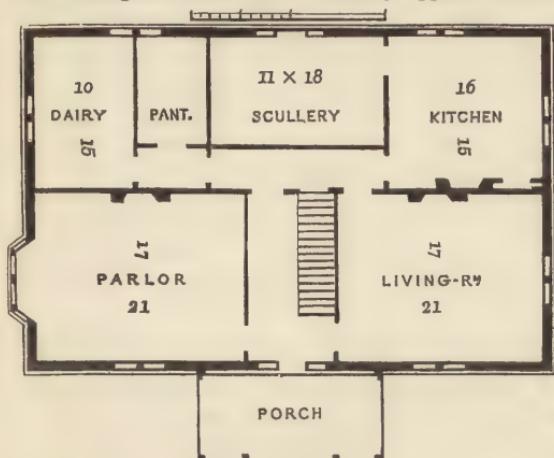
PLAN OF PRINCIPAL FLOOR.
